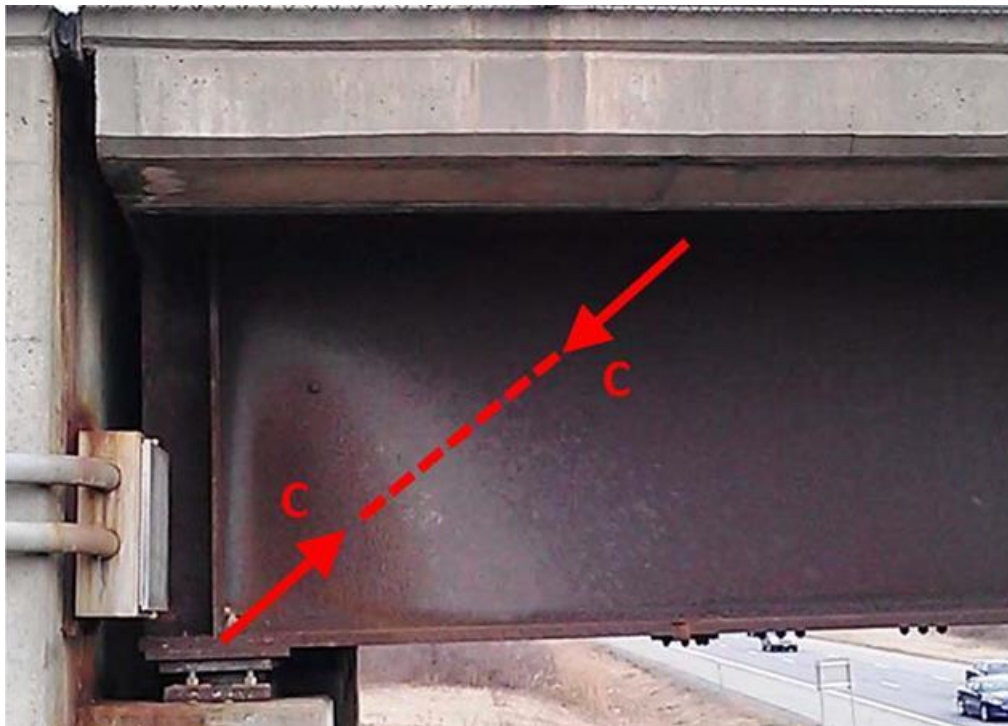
Steel Bridge Girder. Diagonal Line Represents a Compression Path.
